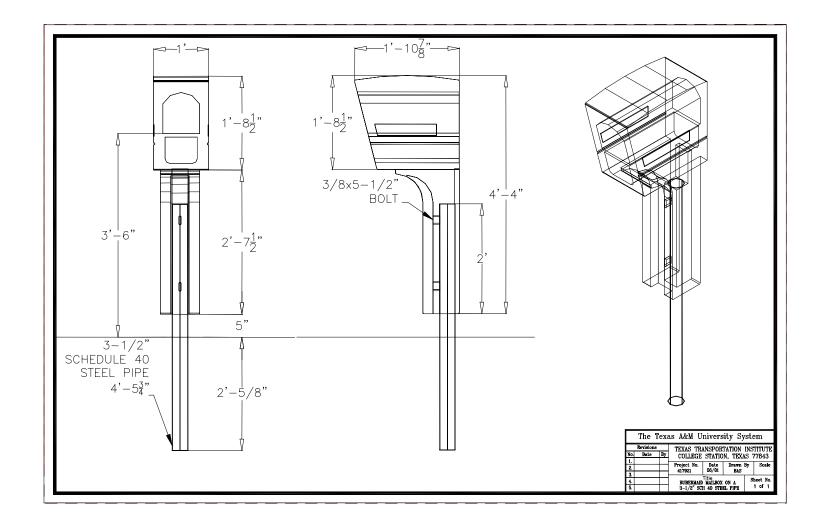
Details of the Rubbermaid Mailbox Mounted on Steel Pipe Post.
